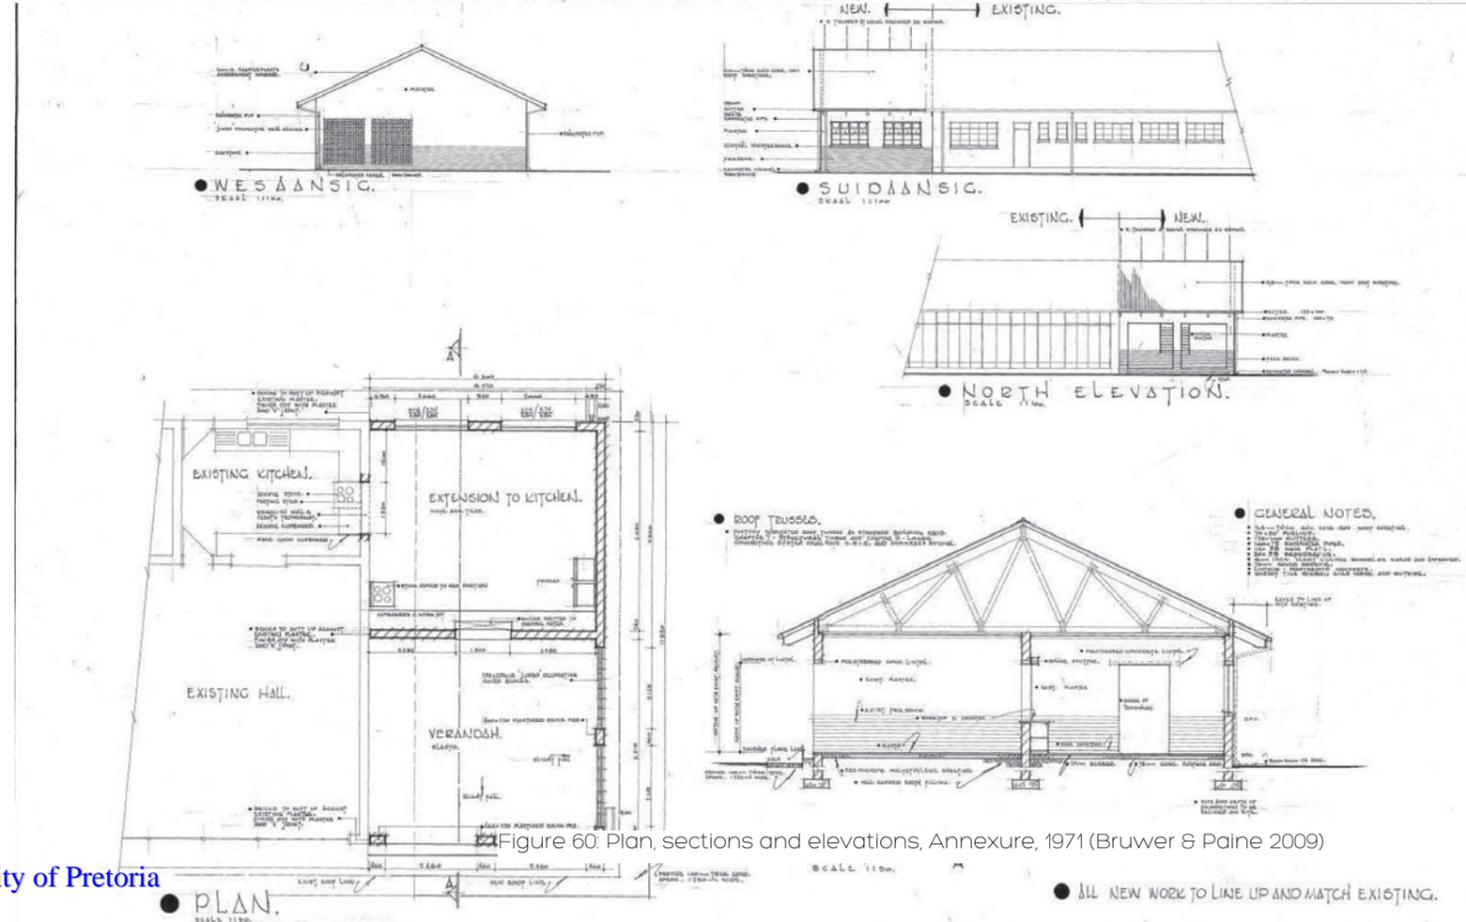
Plan, sections and elevations, Annexure, 1971 (Bruwer & Paine 2009)
